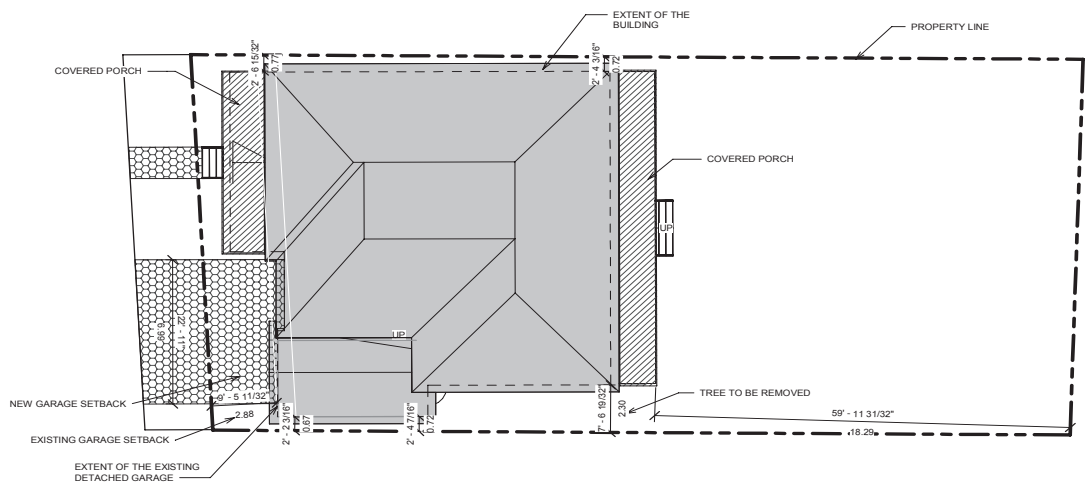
18 Byron Ave E. proposed site plan with parking for two vehicles to the south/front of the site. HCD plan recommends two single track driveways with turf installed between in order to minimize the impact of hard surfacing. Drawing by Third Layer Architects, 2021.
